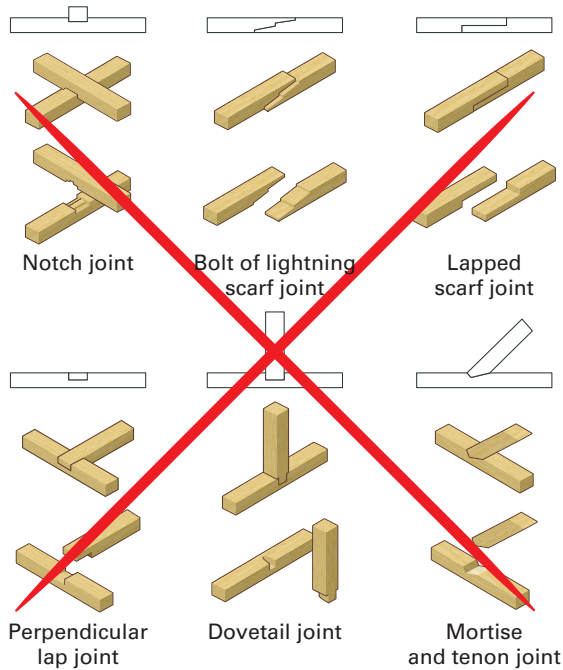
Examples of carpentry joints that require devices to hold them in position even when the loads are inverted
